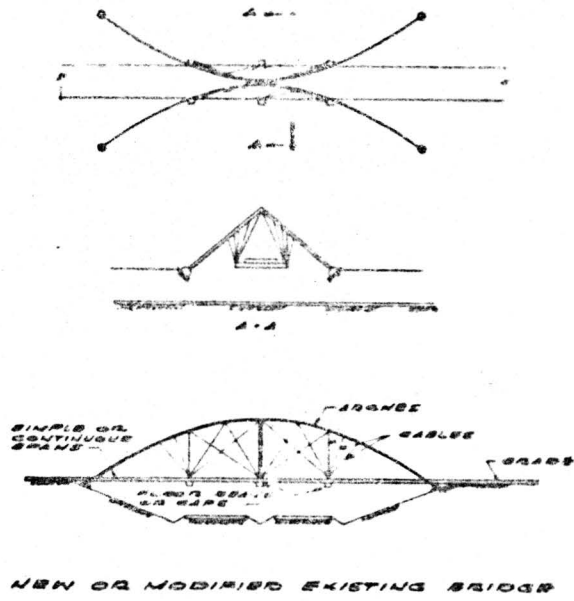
LEANING ARCHES BRIDGE CONCEPT
